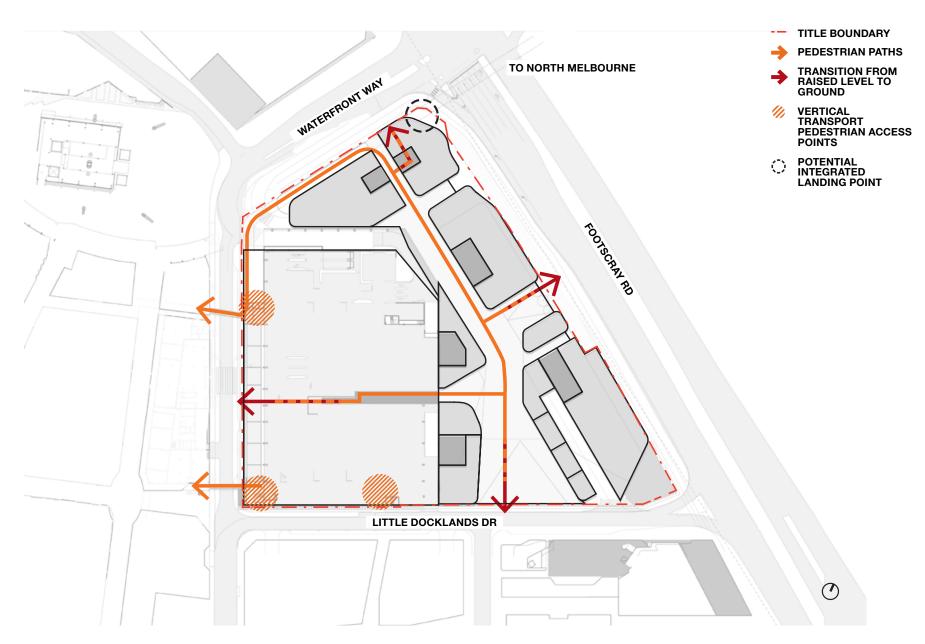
Movement and Parking Plan 4 - Level One pedestrian paths and access points
